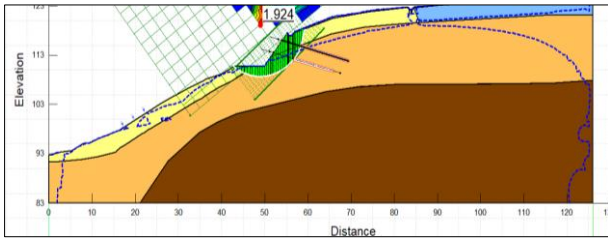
Stability of Initial Excavation with soil nailing [Under rainfall conditions]
